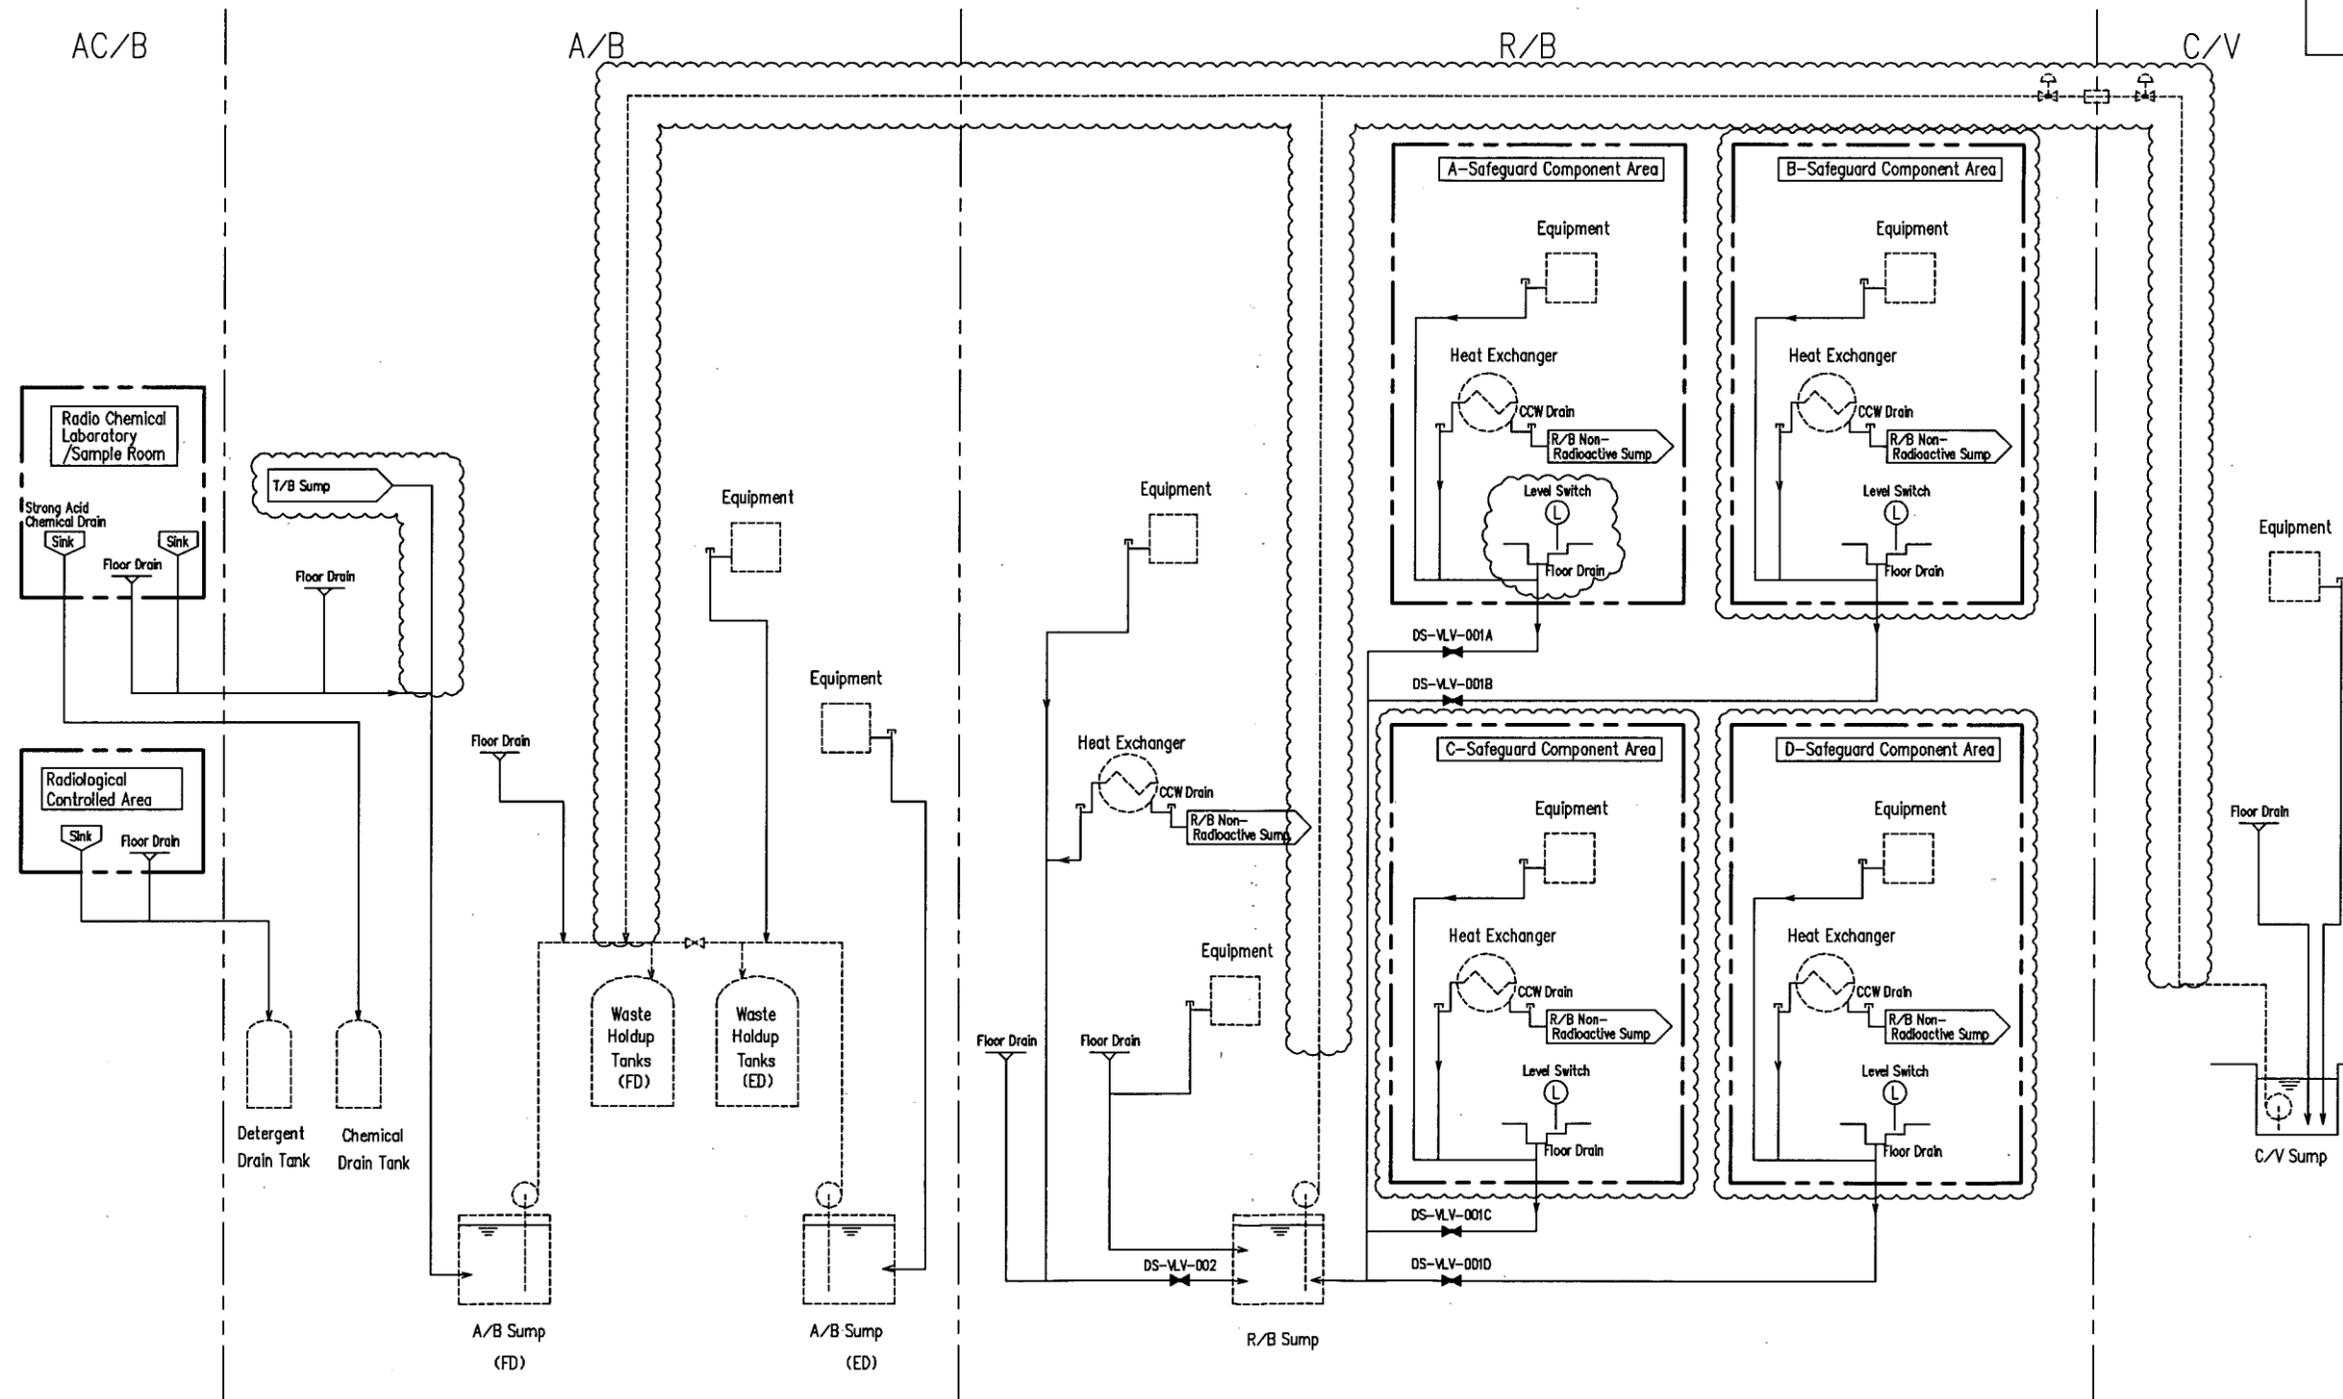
Equipment and Floor Drain System Flow Schematic (Sheet 1 of 2)
